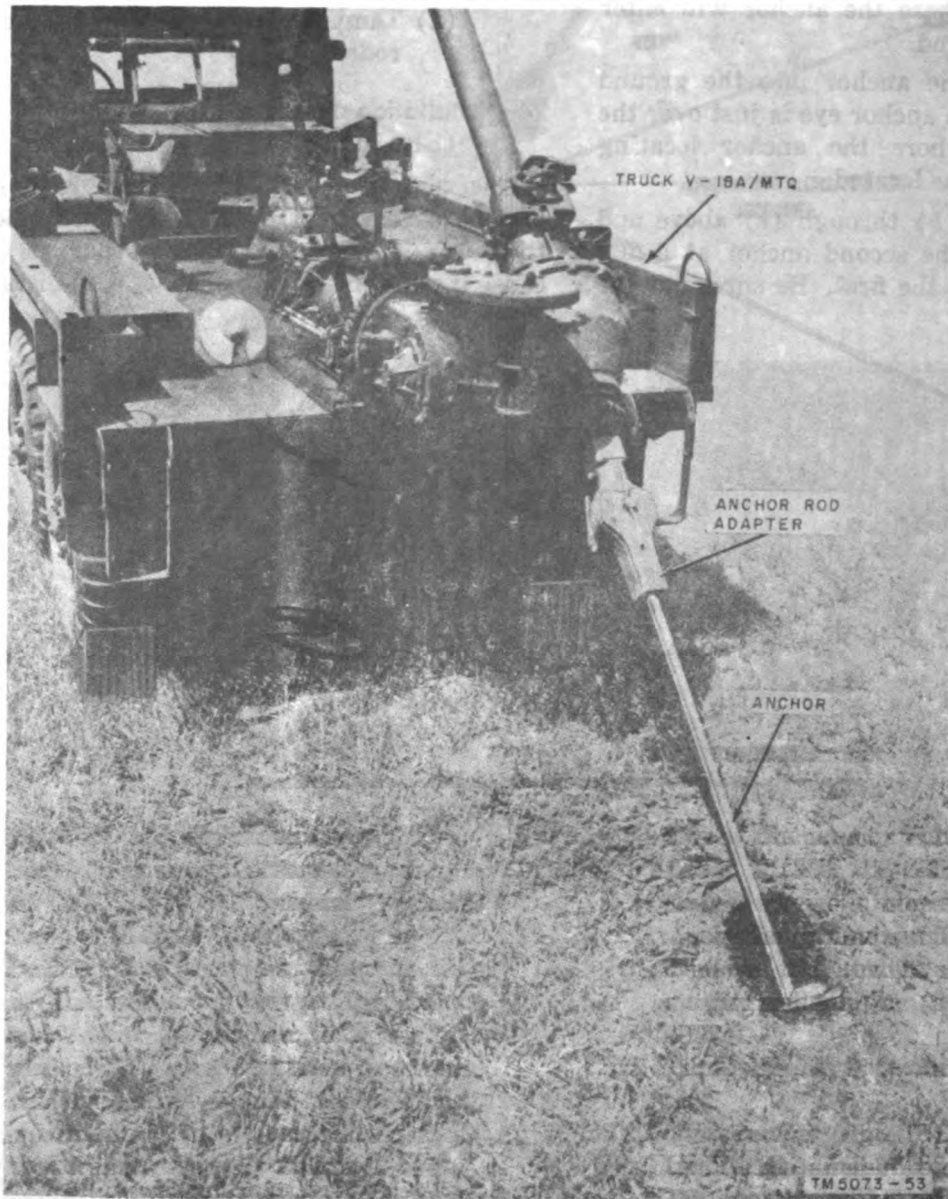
Truck V-18A/MTQ, using boring machine to set anchor.
